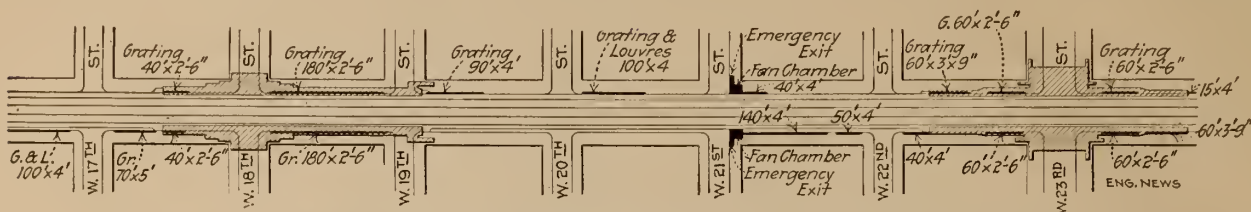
PLAN OF PORTION OF SEVENTH AVE. SUBWAY, SHOWING PROVISION FOR VENTILATION
